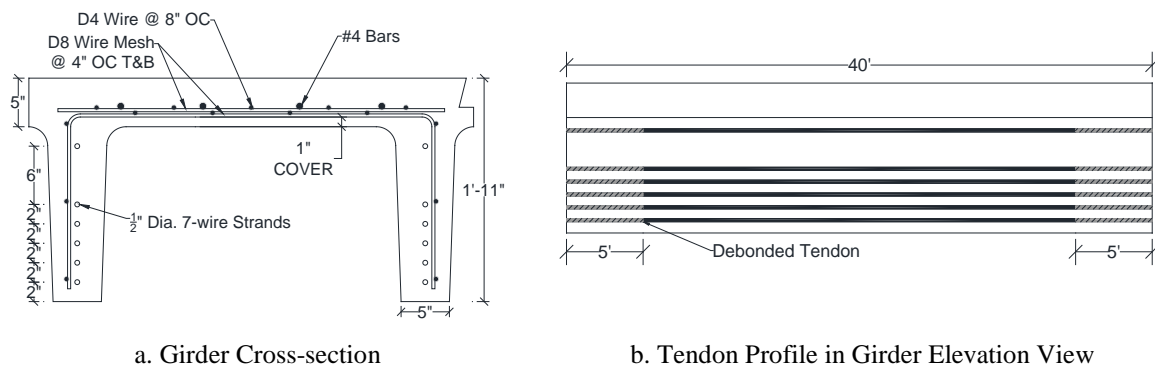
Cross-Section of Typical Double-Tee Girder Bridges
